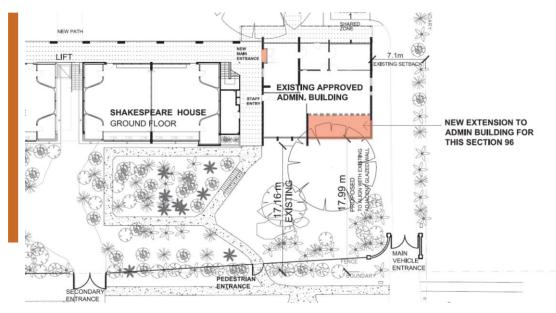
Proposed Site Plan Extract showing setbacks (Source: Templum)
